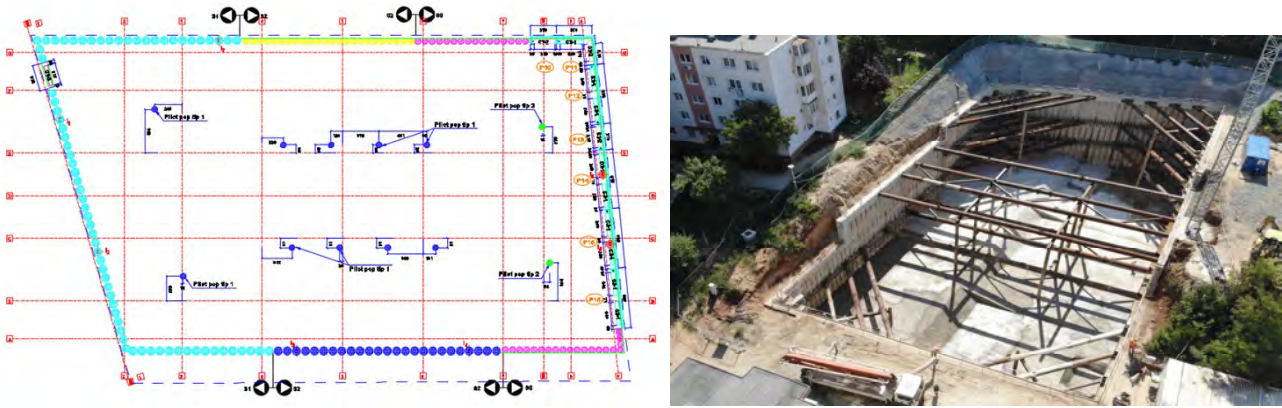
left: Pit enclosure layout – cased piles retaining wall and diaphragm wall, right: construction site photo
